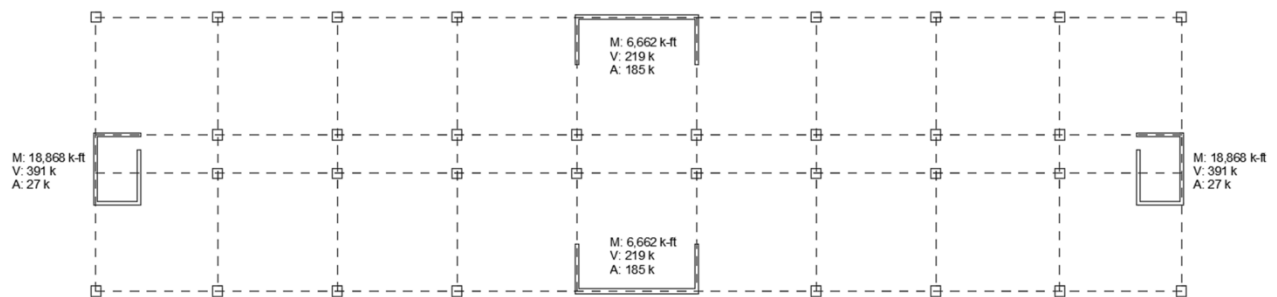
ETABS output of axial load, shear force and bending moment at the base of each structural wall ground floor
